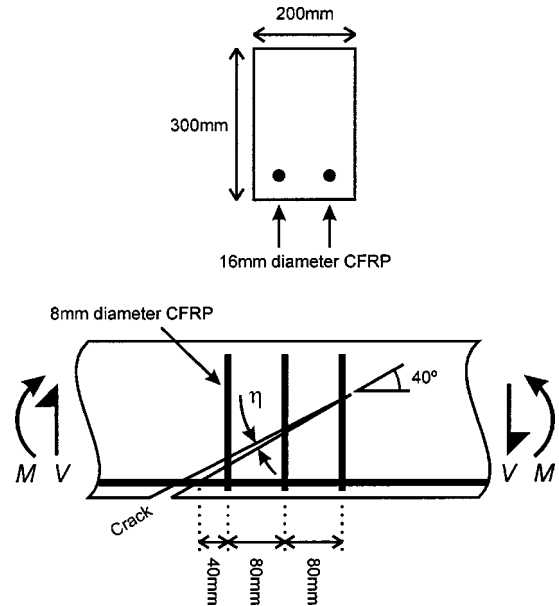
Geometry of single shear crack example, showing shear reinforcement arrangement
